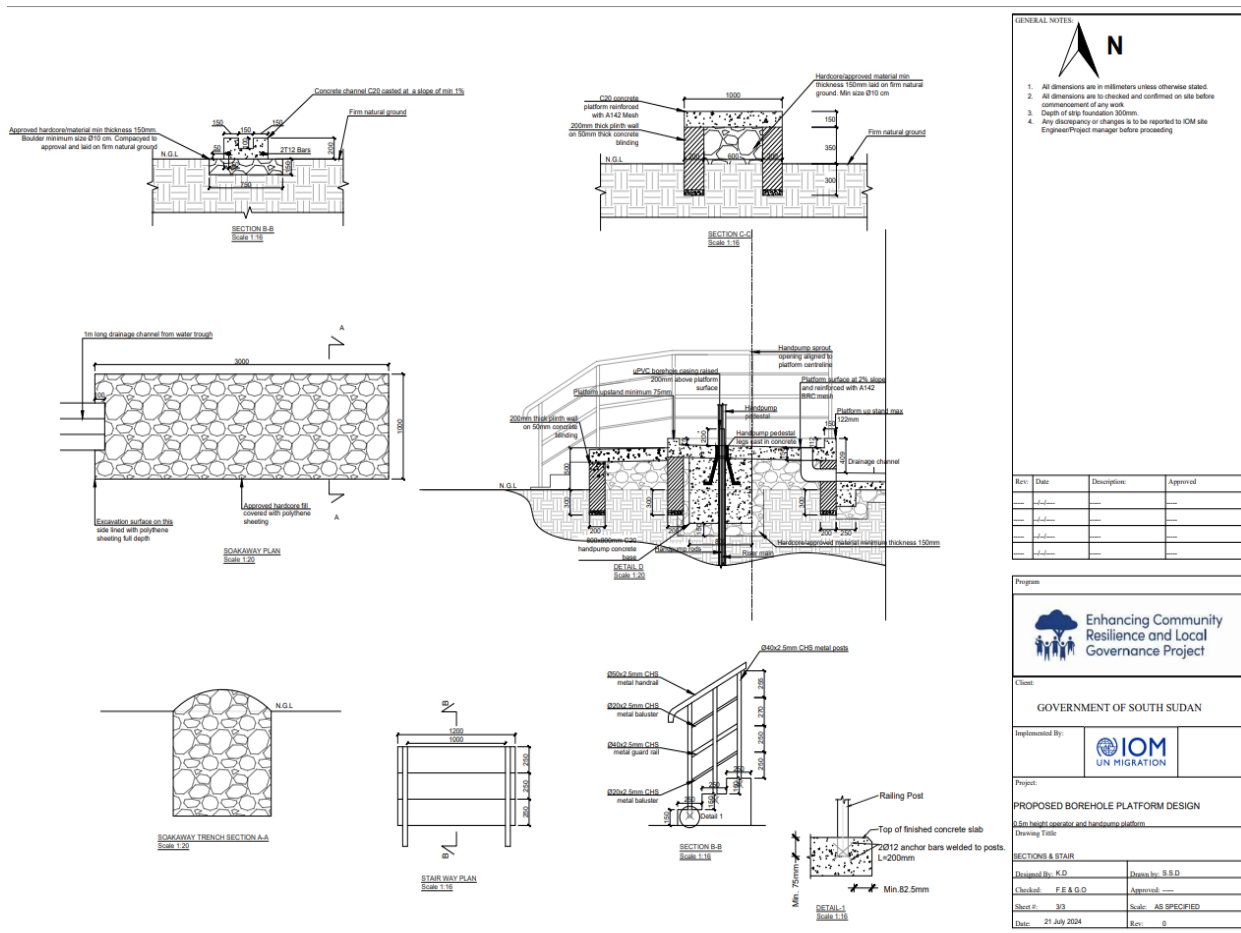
Construction design for a protected borehole handpump platform, complete with drainage, soak away pit, and stair access.
